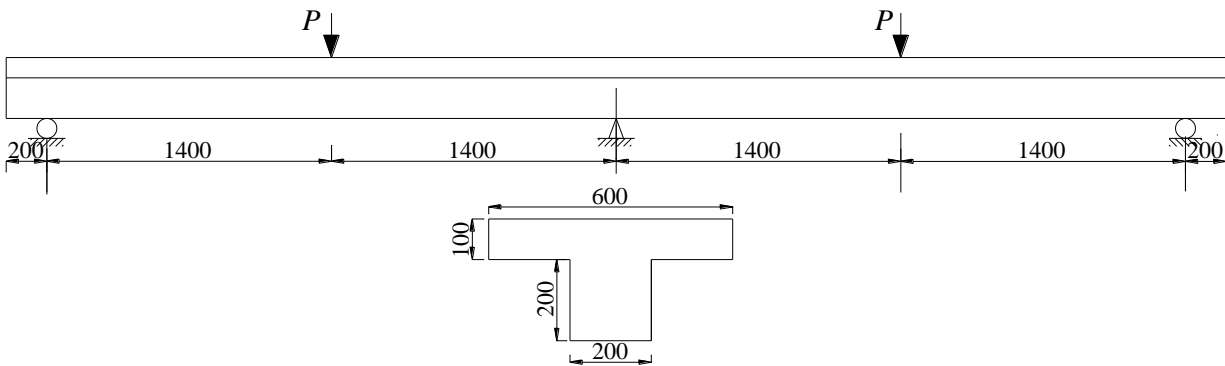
Loading condition with longitudinal and sectional profile of the test beams of Series 1
